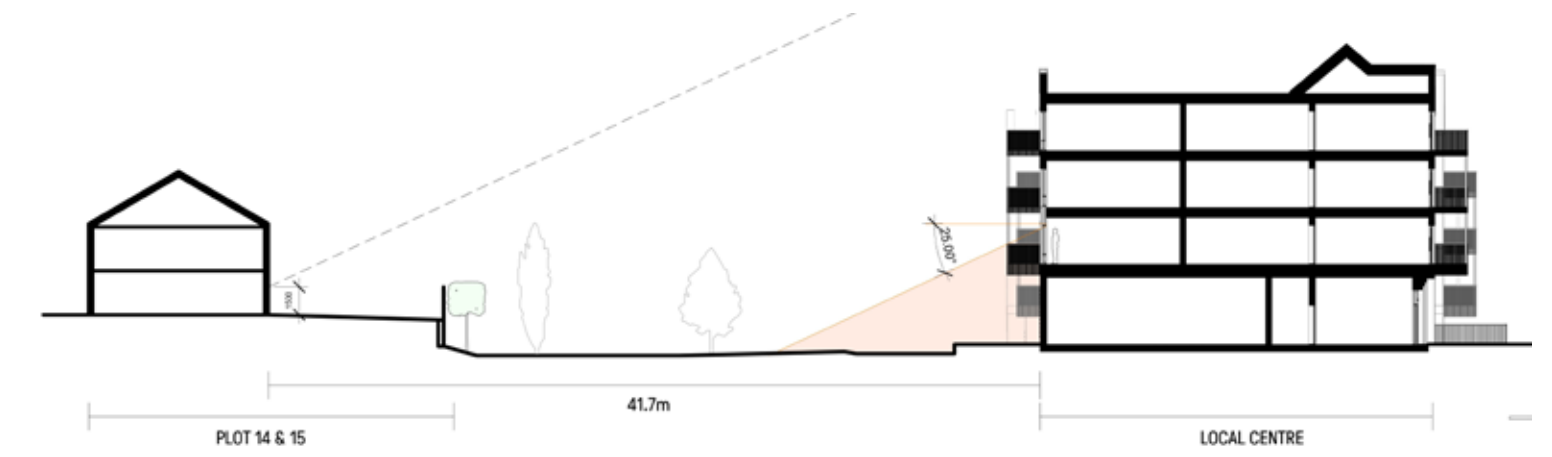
Local Centre & Plot 14 & 15 First Floor Privacy Section post Design Workshop/Update
